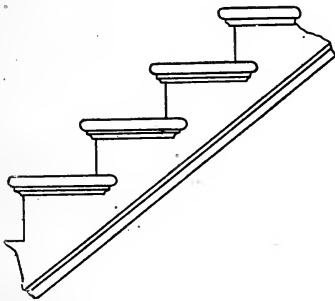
Portion of Finished String, Showing Returned Nosings and Coves, also Bead Moulding.
